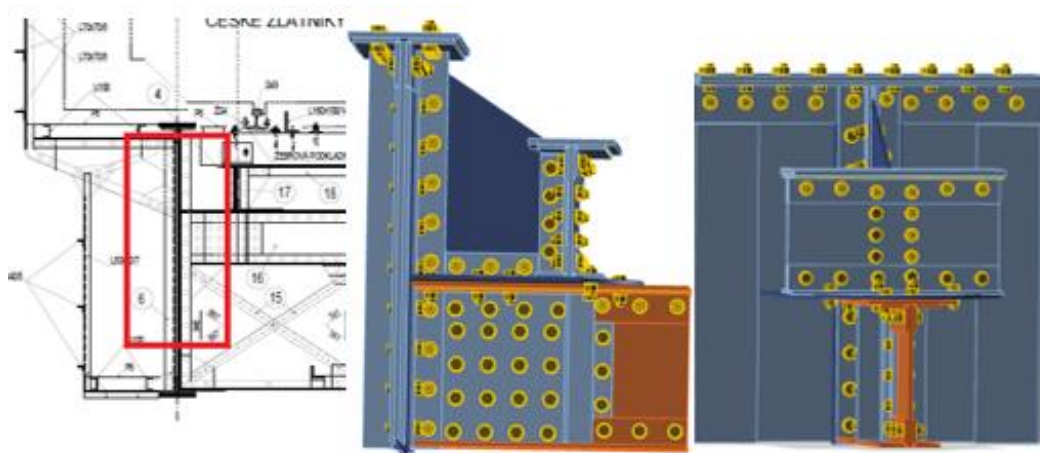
Joint of interest on TU 581, main girder with the cross beam. Ref. [16]
